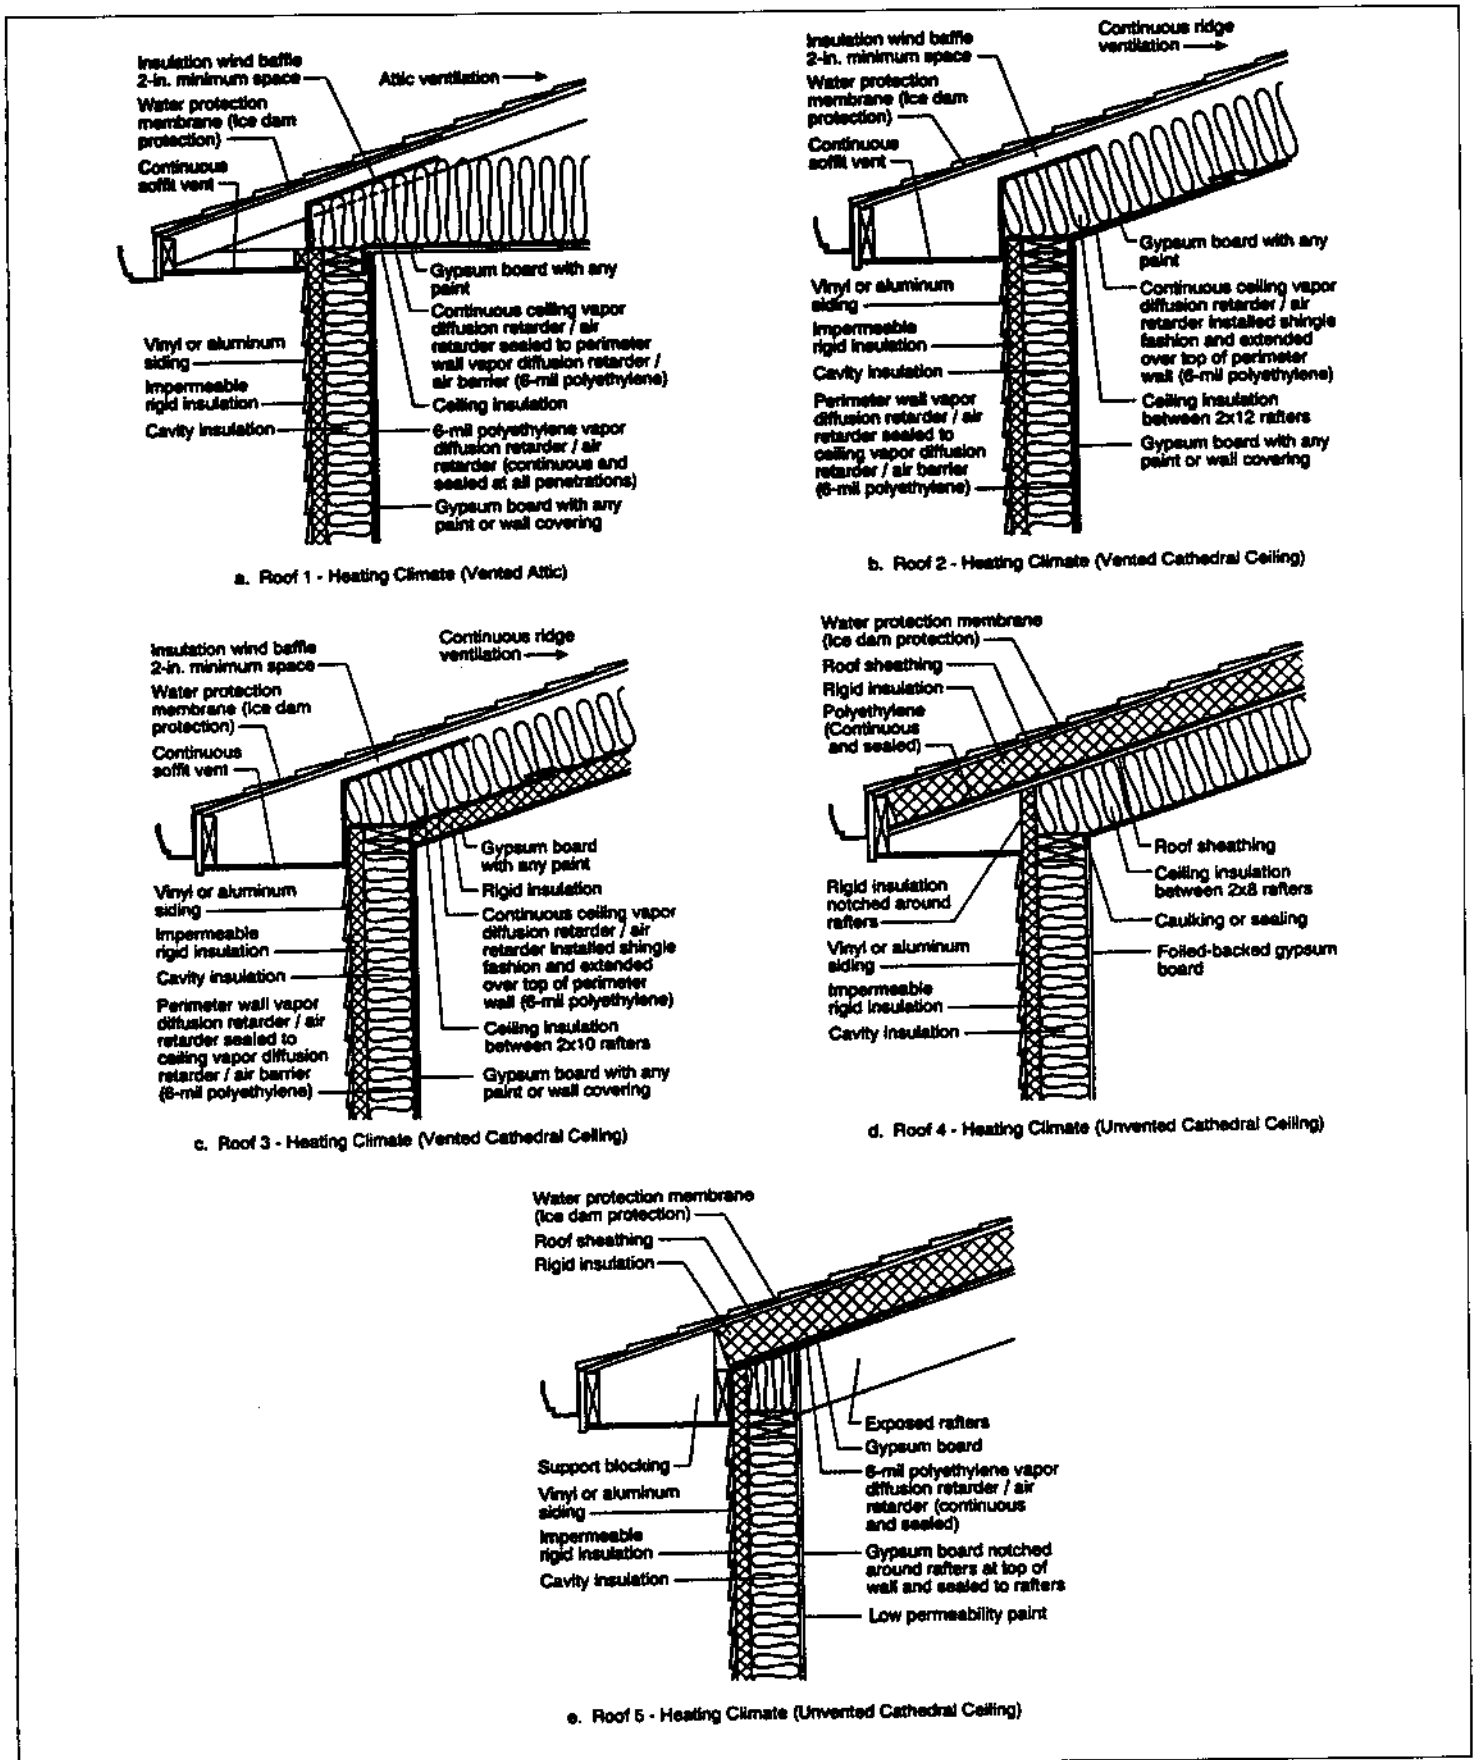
Half cross sections of cold (heating) climate roof constructions.
